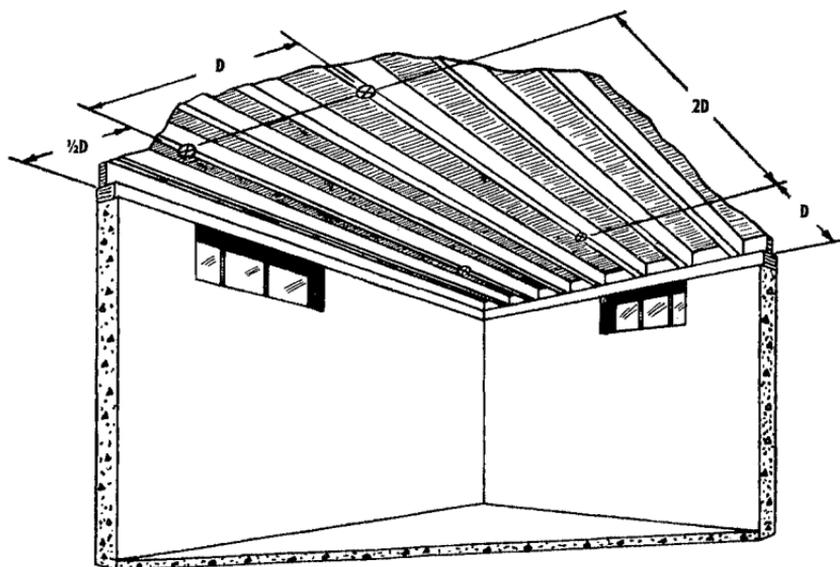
Open joists, attics and extra high ceilings are some of the areas that require special knowledge for installation.
